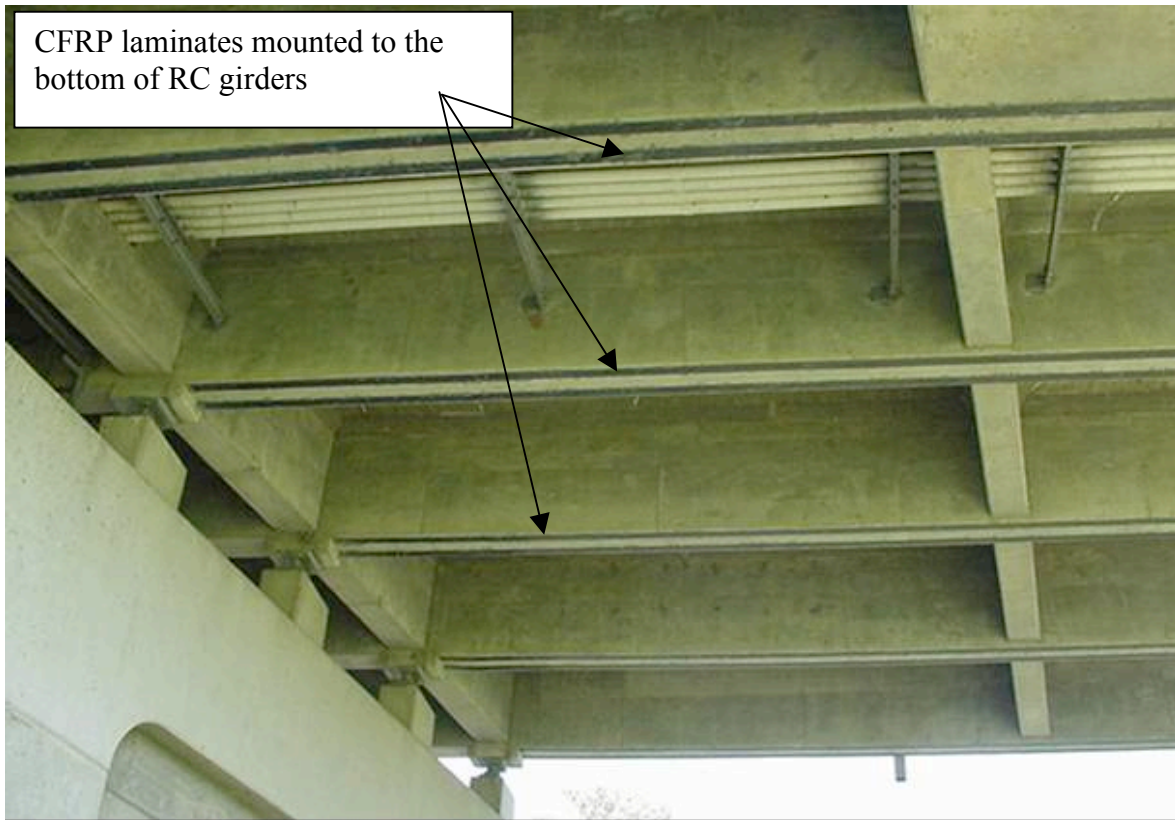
Girders in span 6 strengthened with CFRP laminates in the Louisa-Fort Gay bridge
